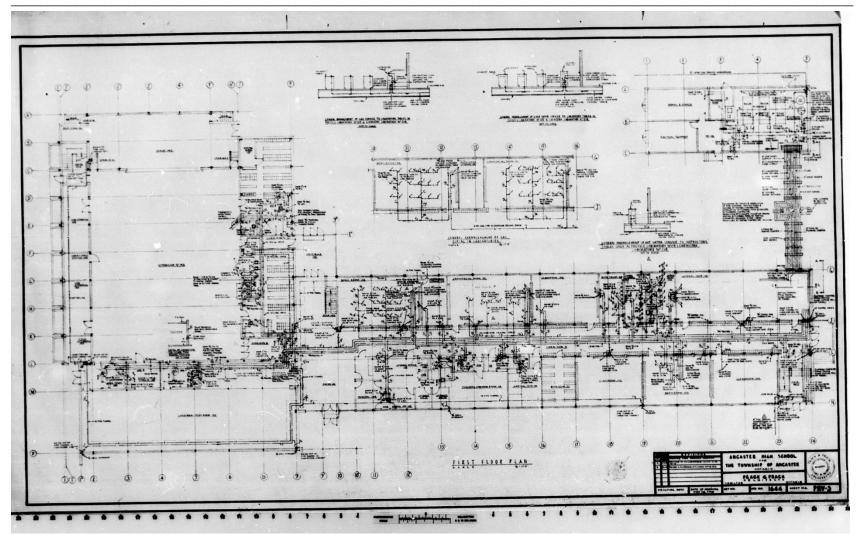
Ancaster High – Prack & Prack First Floor Plan (PHV-3) (Slide 41-30: Provided by Hamilton Wentworth District School Board Archives)
